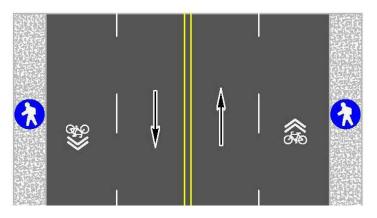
C: Southampton Street (Narrow Section) Alternative A Cross Section
